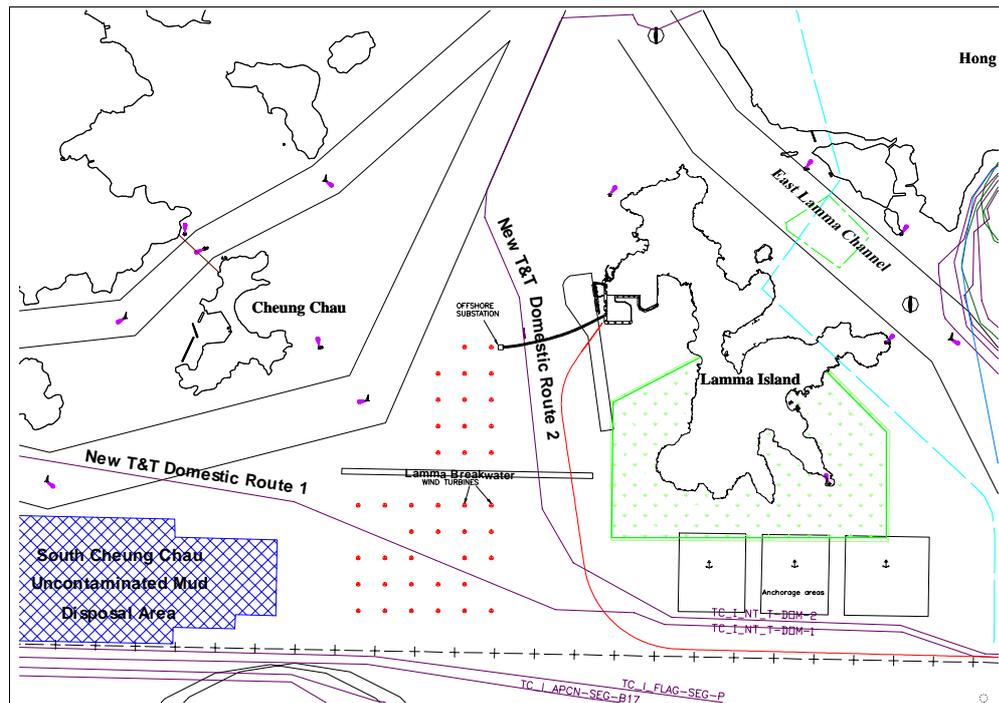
Layout of Southwest Lamma Potential Site
